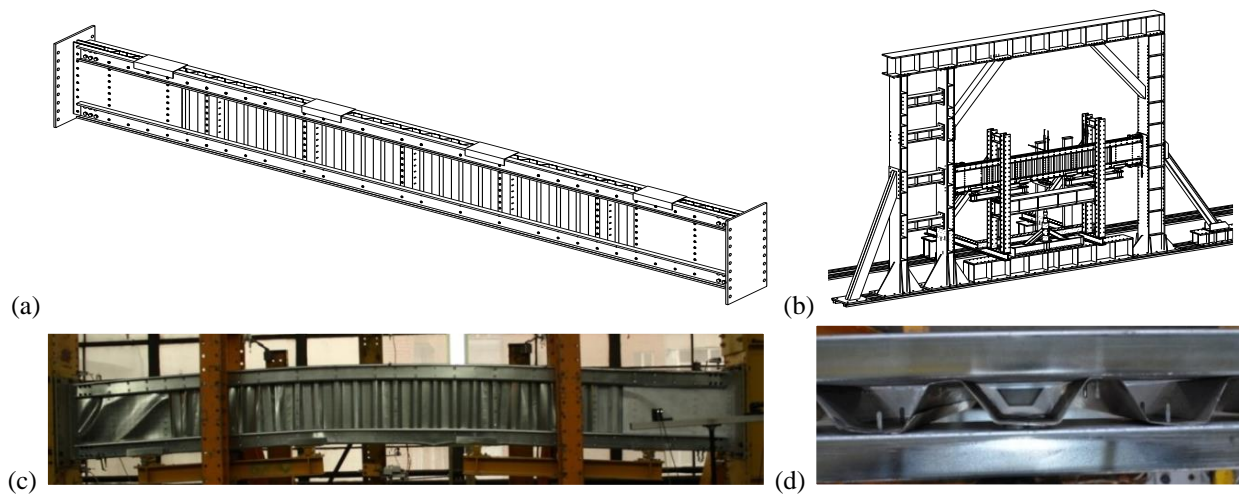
(a) Configuration of the specimens; (b) Experimental arrangement;
